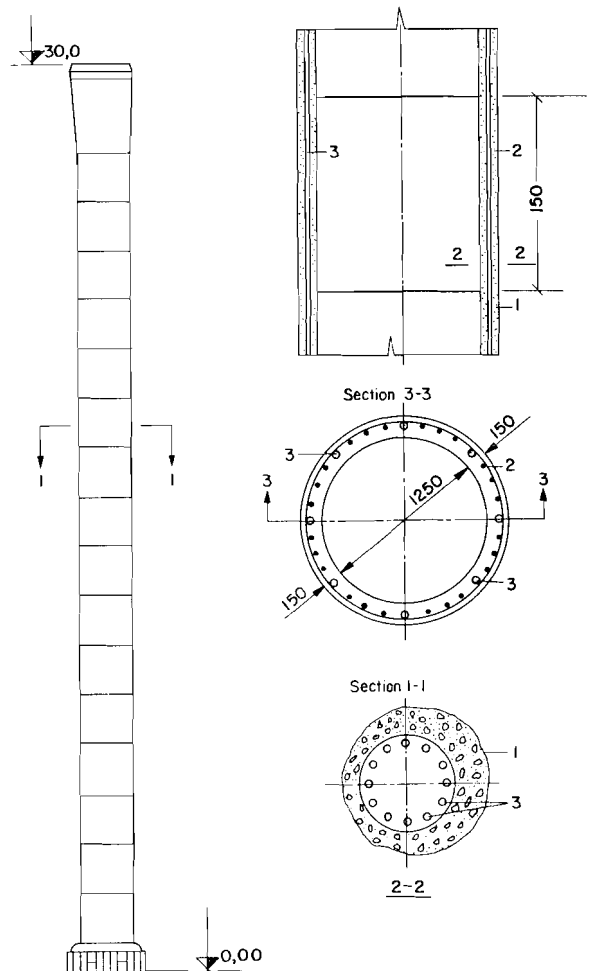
The design of a chimney of 30 m in height for diversion of gas with temperature of 300 °C. Constructed of prefabricated fire-proof prestressed members.
